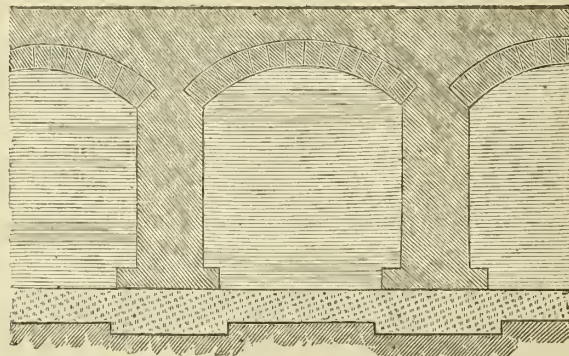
FRONT WALL OF VINERY, ARCHED.
